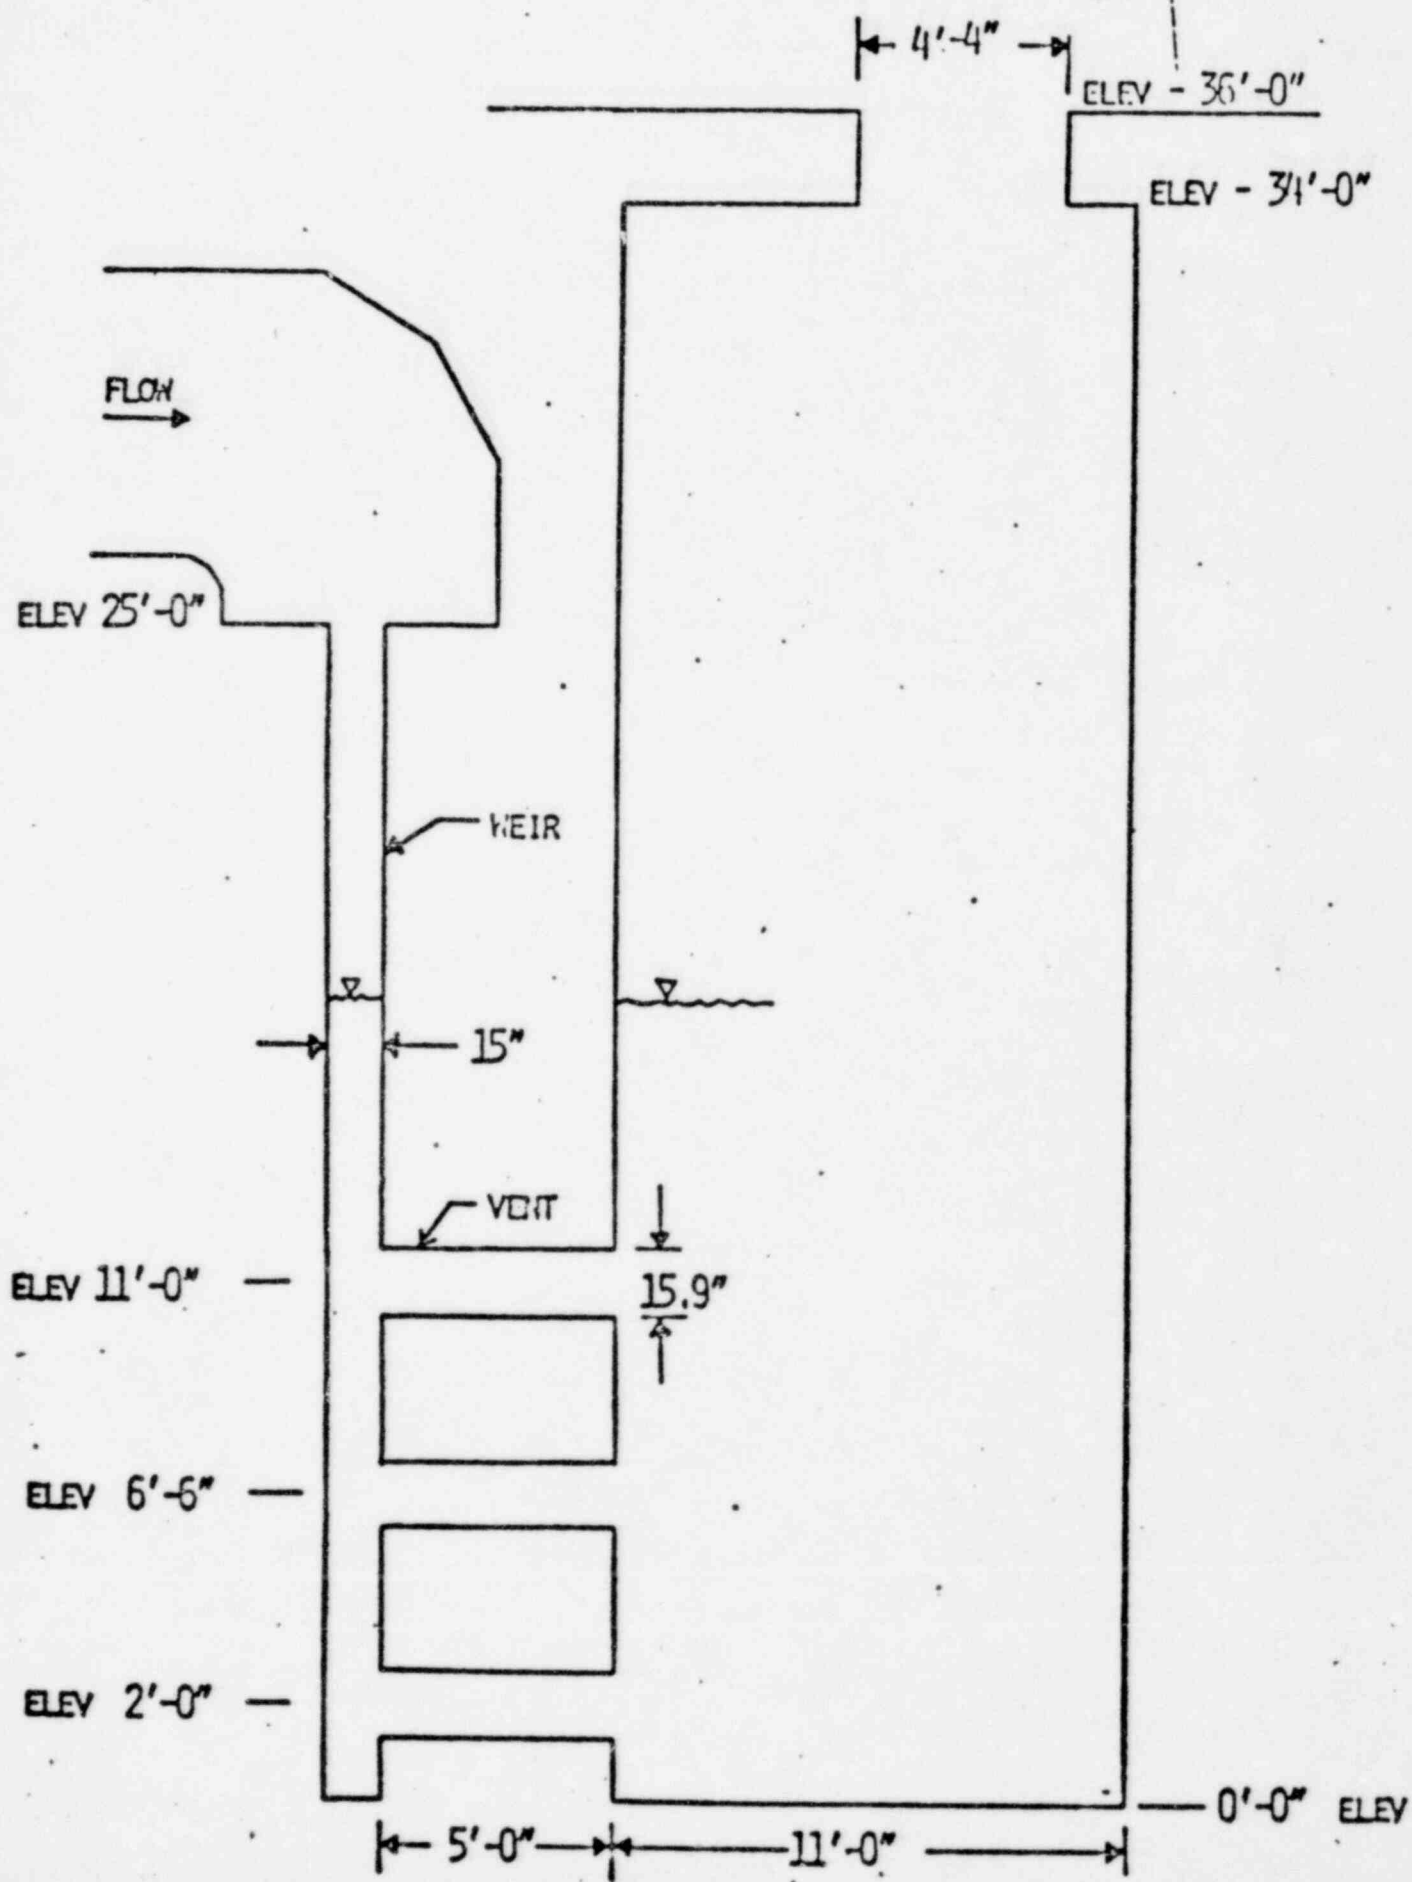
TYPICAL HORIZONTAL VENT TEST SECTION
